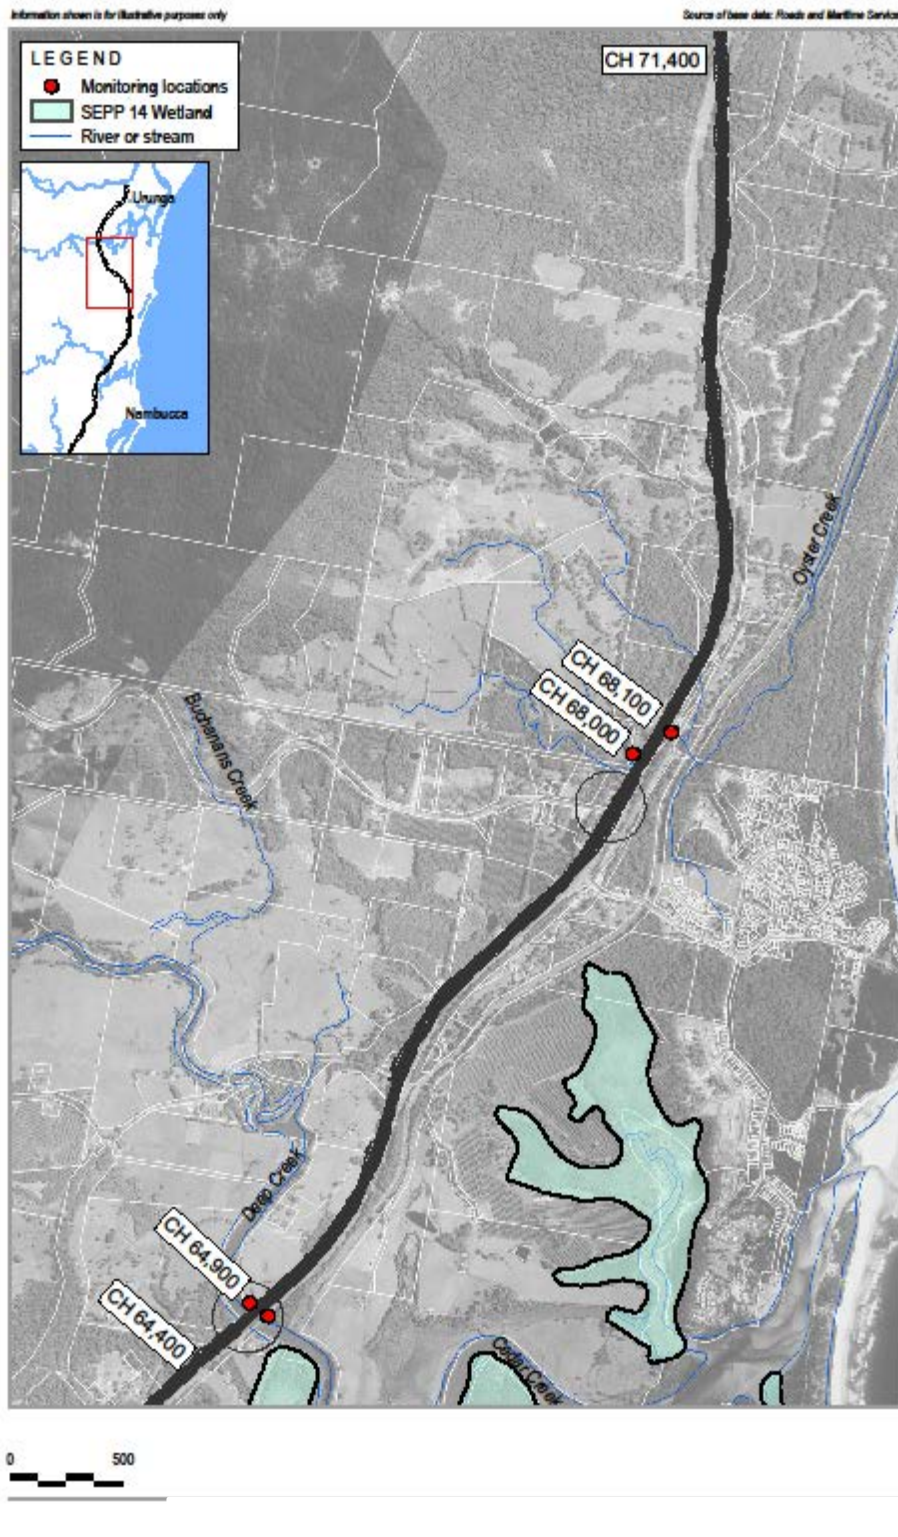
Construction Monitoring Locations Ch 64,400 to 71,400
